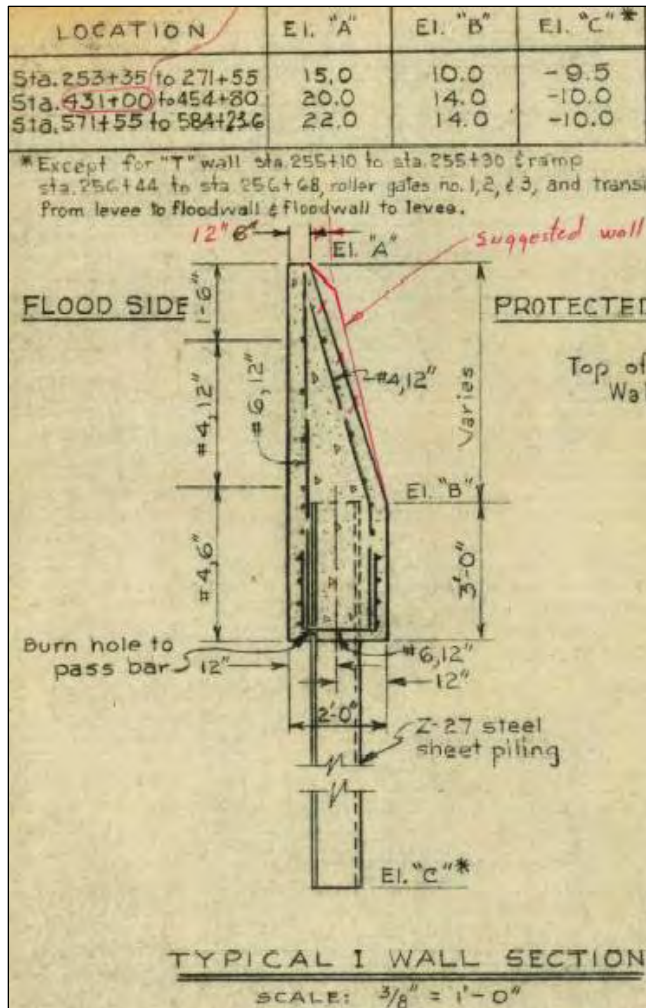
NOE4_N. Plate 26 Shows Sheetpile Elevations
